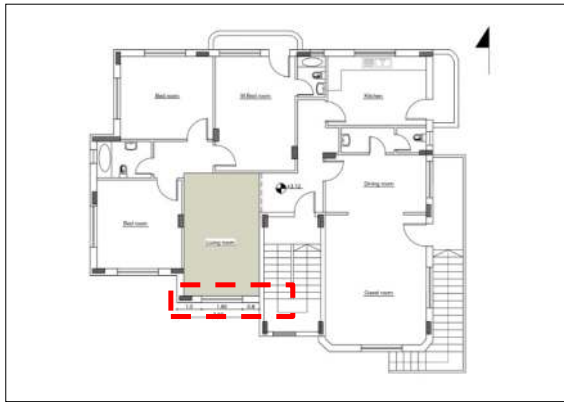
Figure II-A: the selected building plan, the south façade bordered by red line and the targeted room is highlighted
